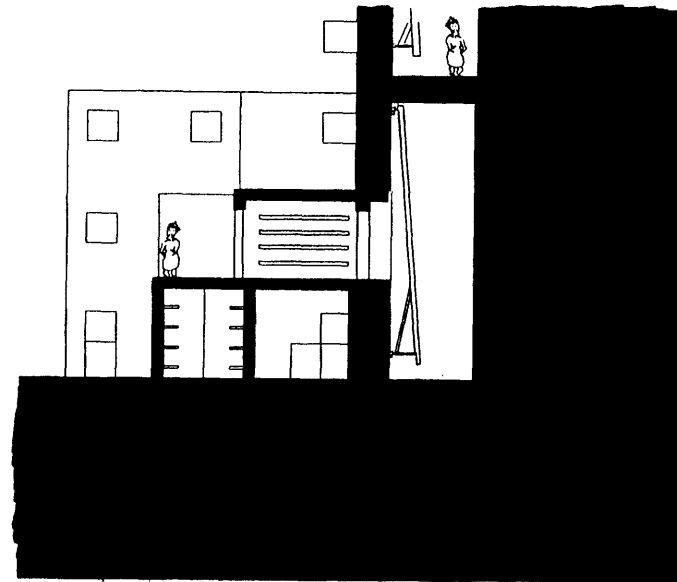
Detail of hallway and 1,331 cubic feet storage rooms
